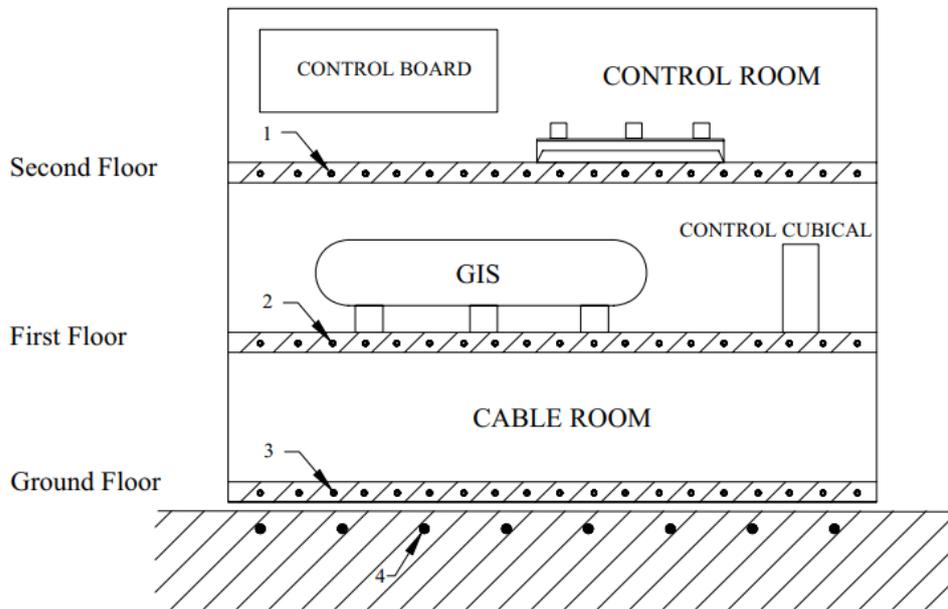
General earthing layout of GIS installation. 1) control room earthing grid, 2) GIS earthing grid, 3) cable room earthing grid, 4) main earthing grid. (Thasananutariya et al. 2004)
